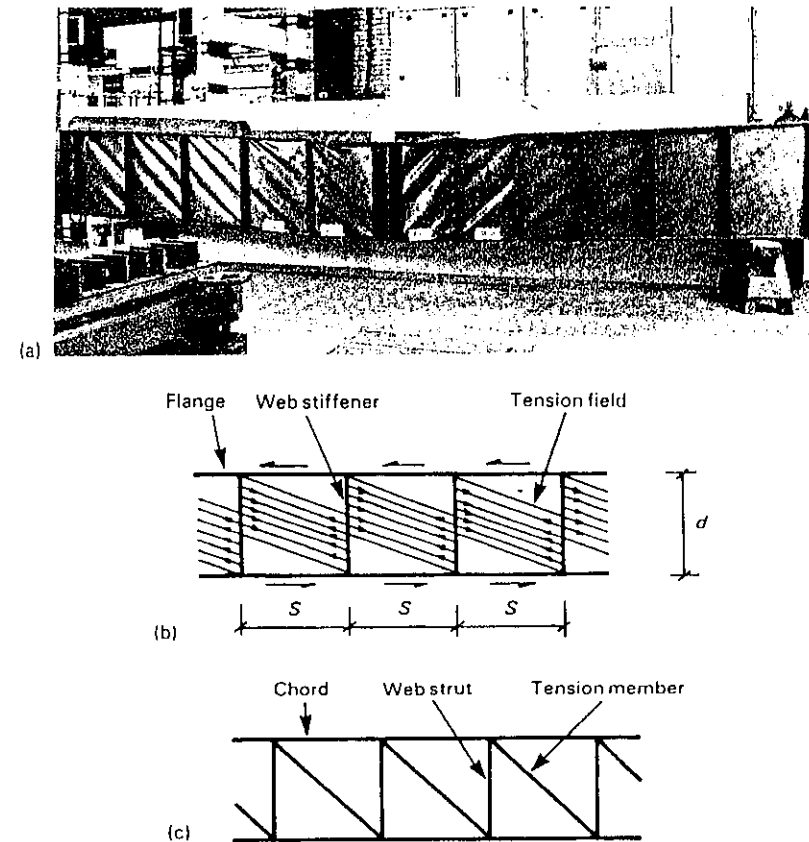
Tension field action in plate girder webs: (a) test girder showing well-developed tension fields (*H.R. Evans*); (b) load-carrying mechanism of tension fields, web stiffeners and flanges; (c) equivalence to behaviour of a truss. (*After ref. 6.*)
